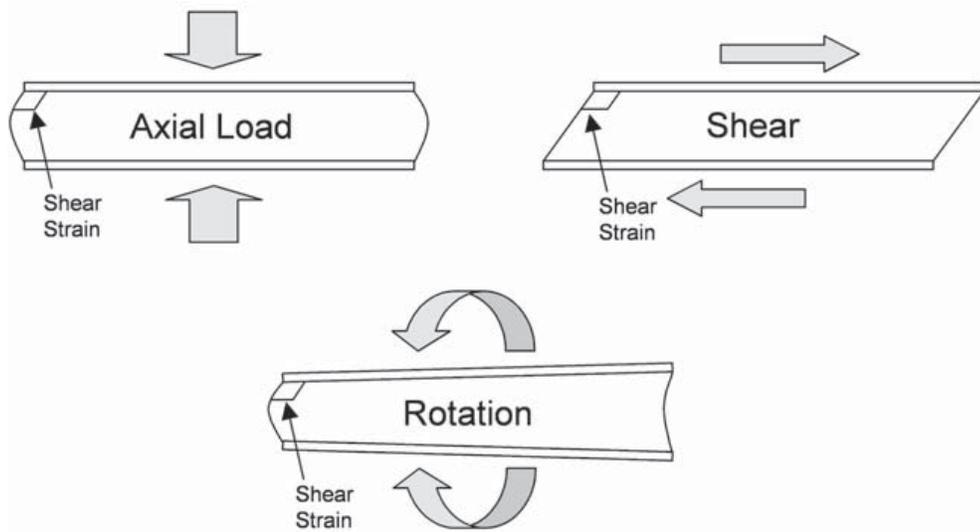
Deformations of a laminated elastomeric bearing layer. (Stanton et al. 2008)
